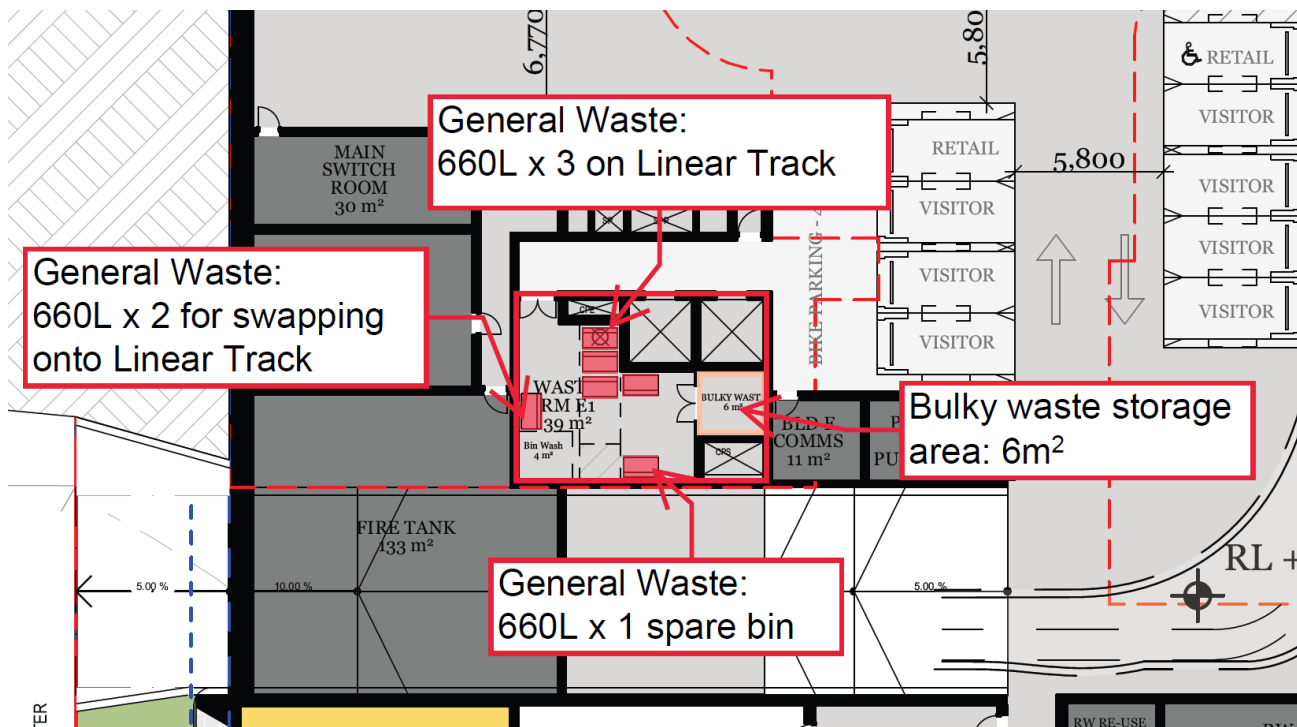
Waste rooms in Stage 2 Ground Floor (D, and E1 and waste holding area)
